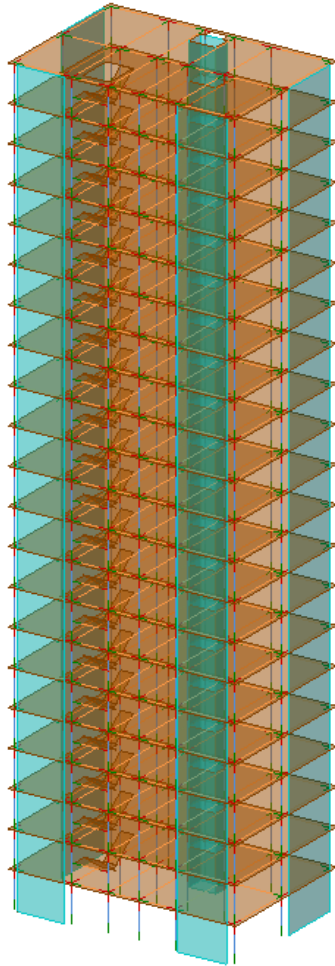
Elevation (3-D View) With Shear Wall At Revit Software
